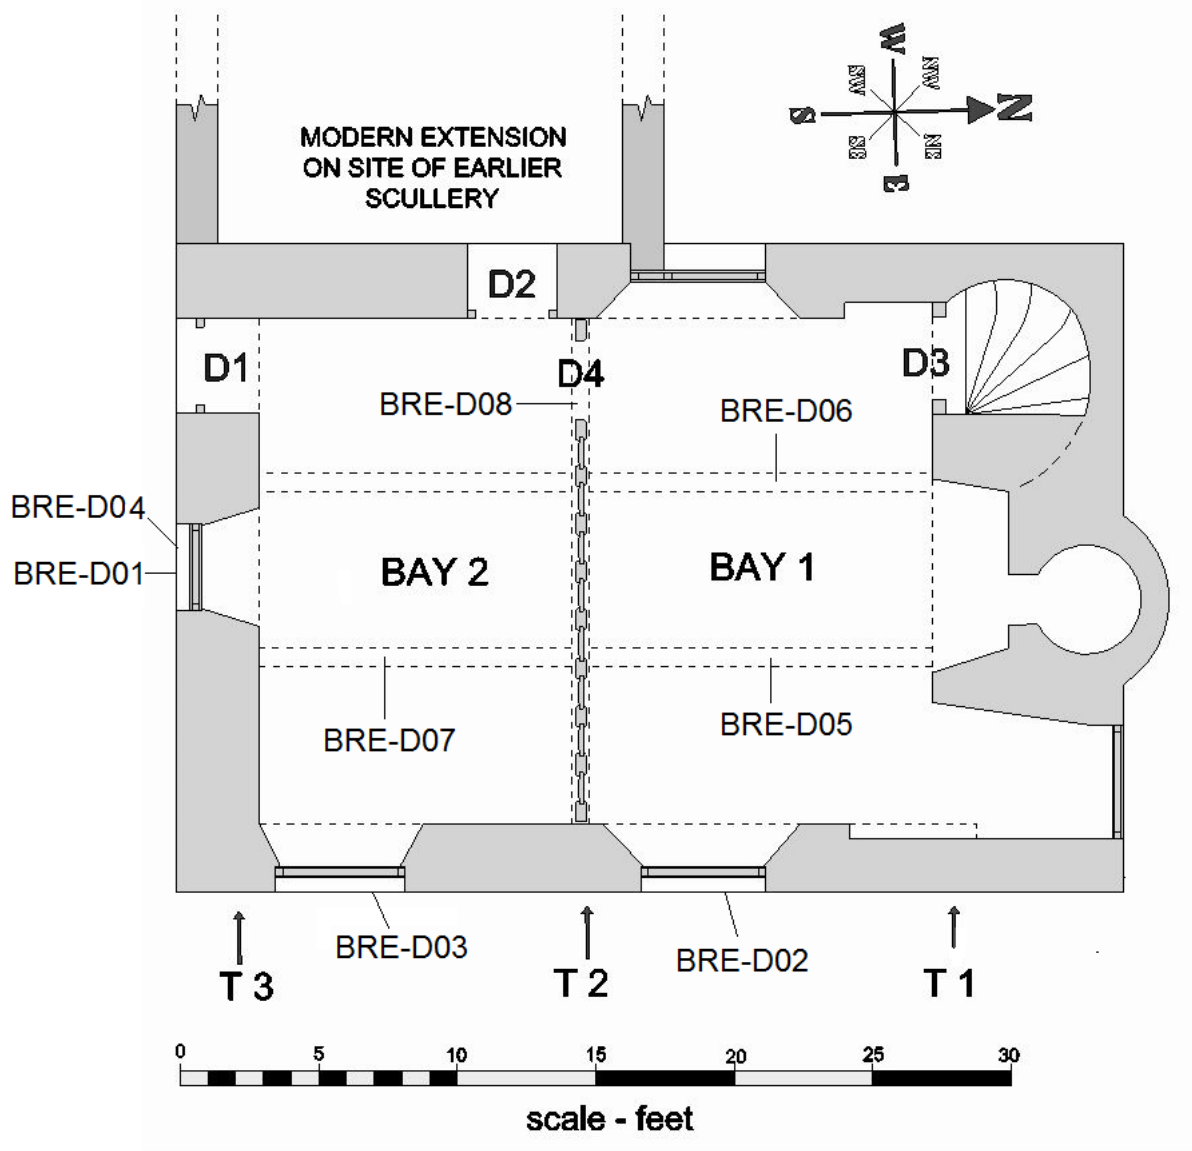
Ground-floor plan, showing the location of samples BRE-D01–08 and truss positions (Duncan James)
